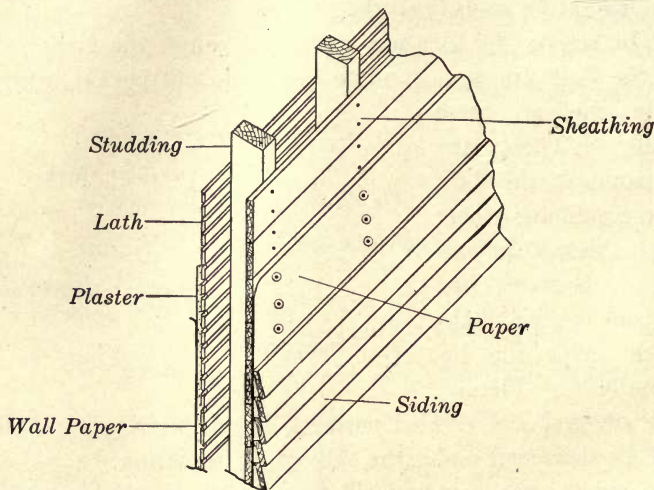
CROSS SECTION OF THE WALL OF A HOUSE.
